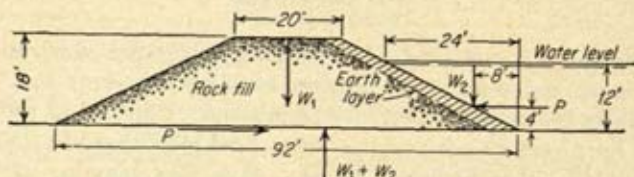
Forces acting on a rock-fill cofferdam.
